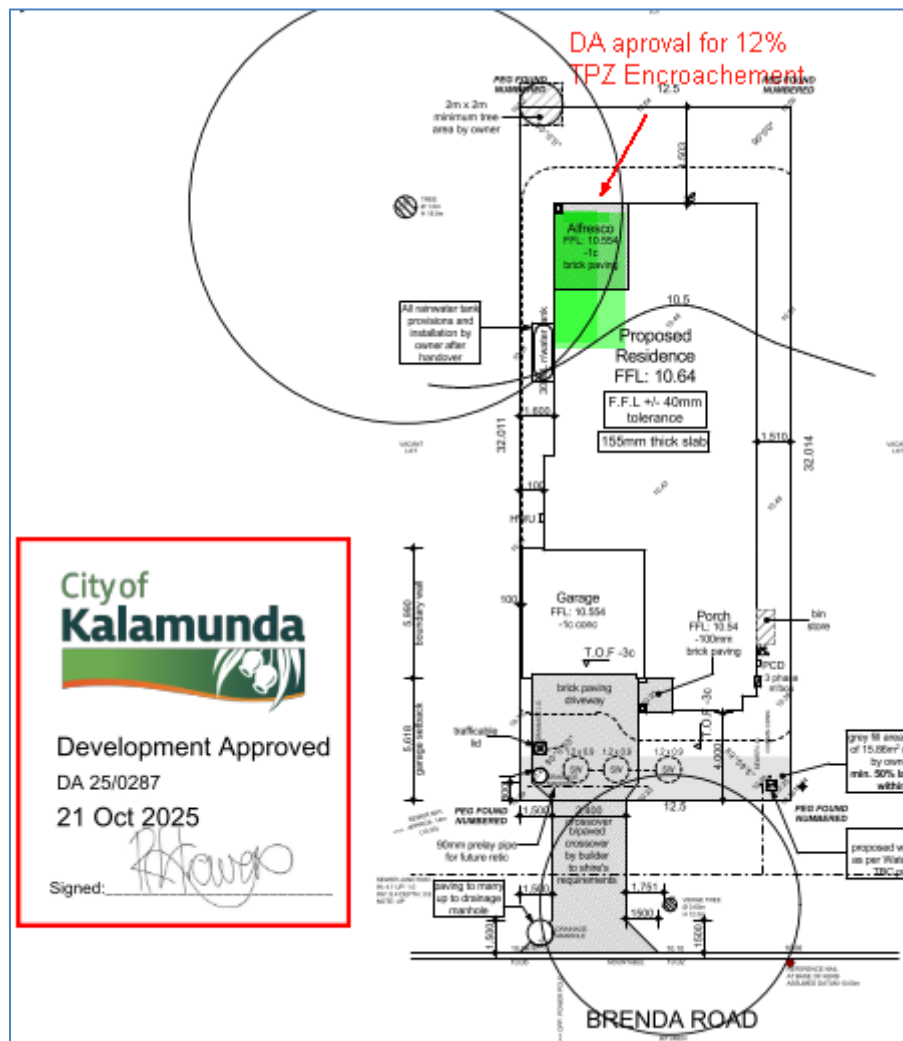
DA approval for TPZ encroachment at Lot 824(No14) Brenda Road
